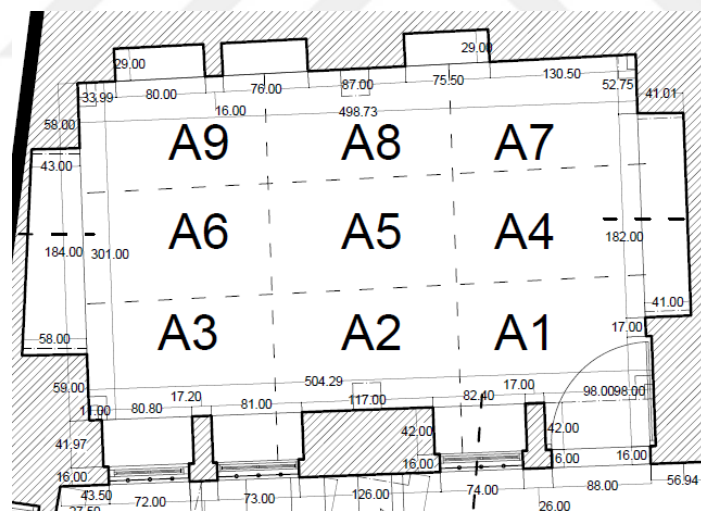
G1 Room plan (TEMA 2008, Organized by Author)
